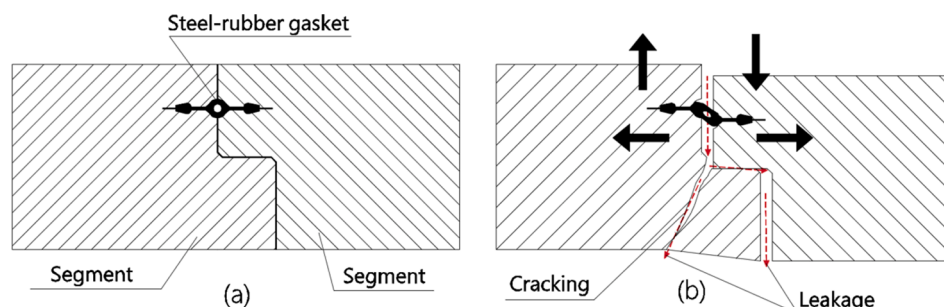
Dilation joint deformation at tunnel roof: (a) schematic of a typical dilation joint and (b) deformed joint.
